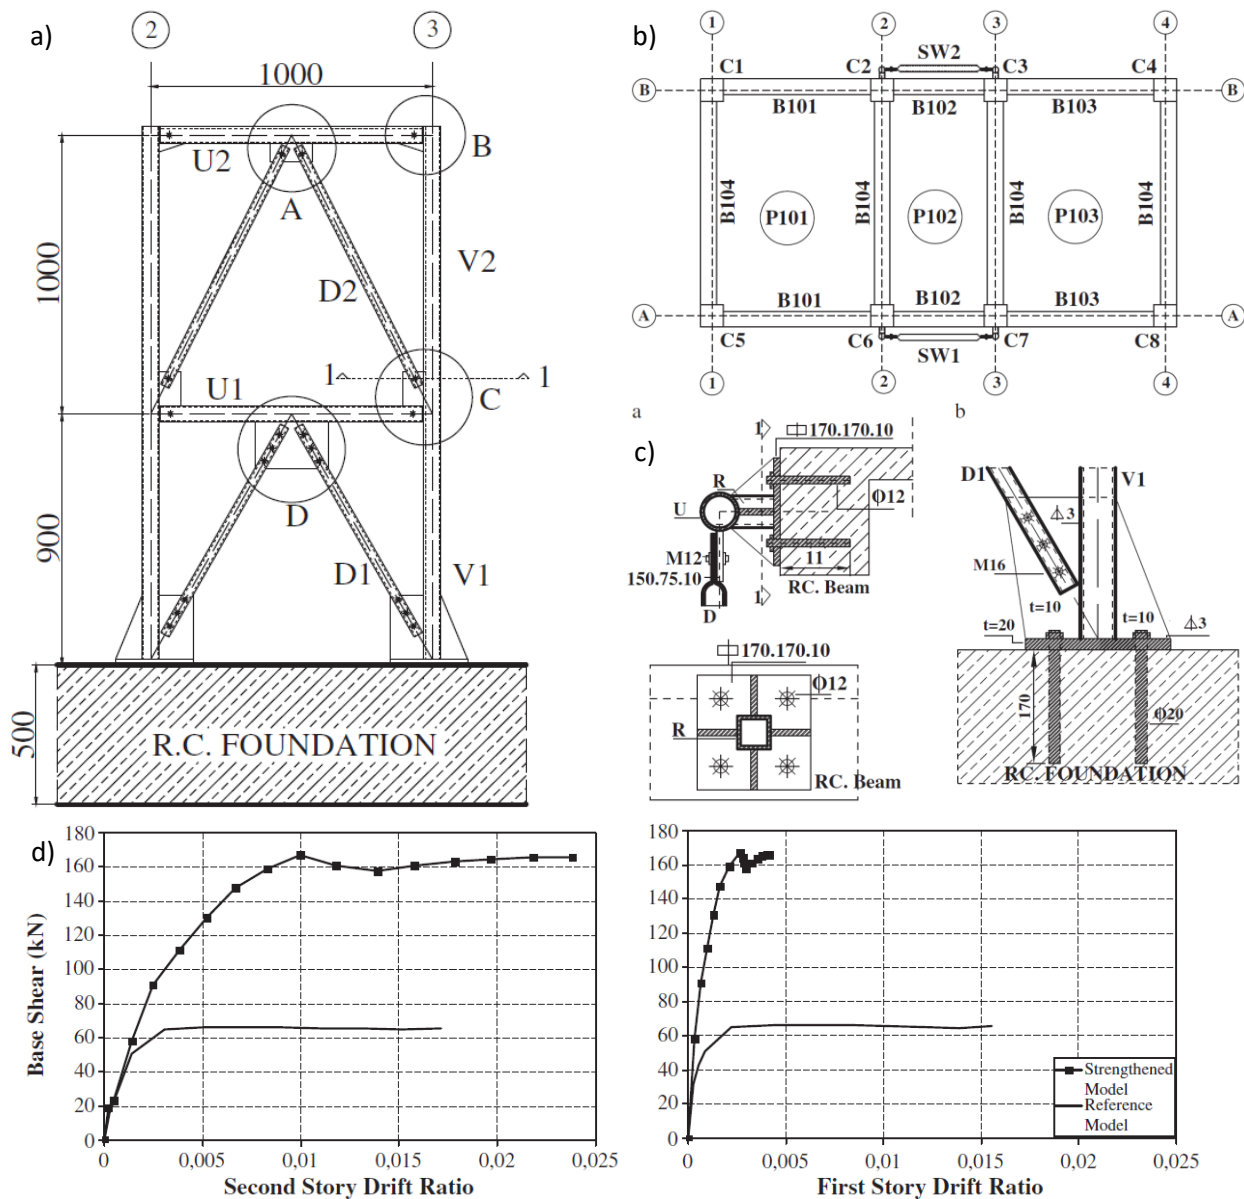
a) Façade view of the steel shear wall; b) plan of the strengthened RC moment-resisting frame; c) details of the connection between the steel shear walls and the RC frame through dowels chemically fixed in the columns; d) base shear force-storey drift ratio of the RC bare frame (reference model) and the strengthened structure – Source: [54]
